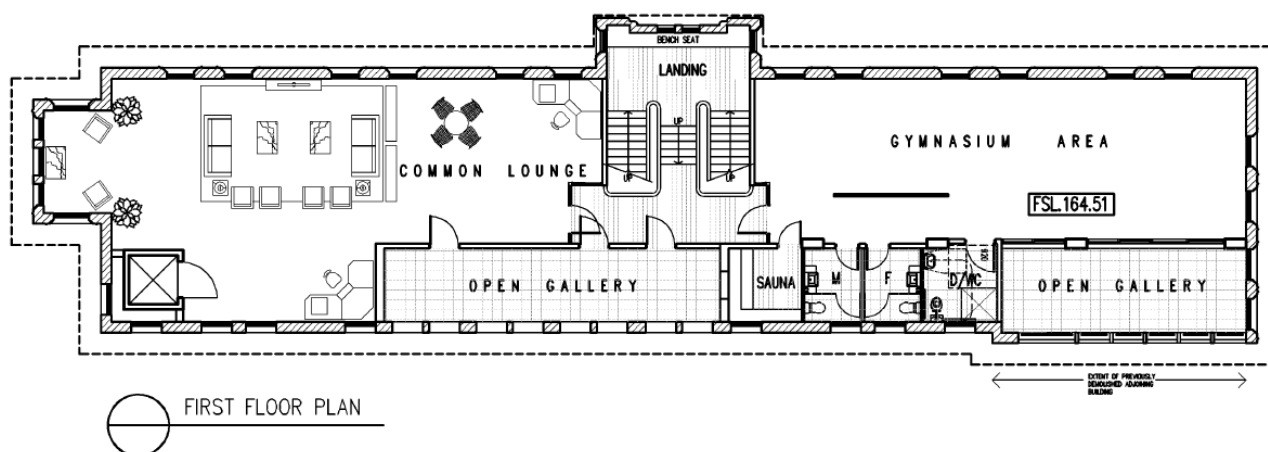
Approved first floor plan of the Monastery building providing some of the community facilities.
